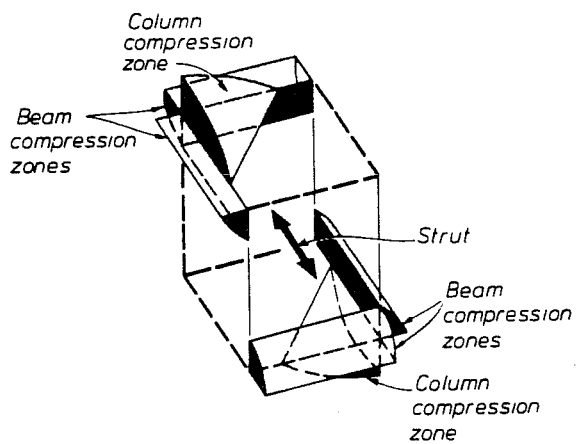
Space Frame Interior Joint, [Beckingsdale (5)].
